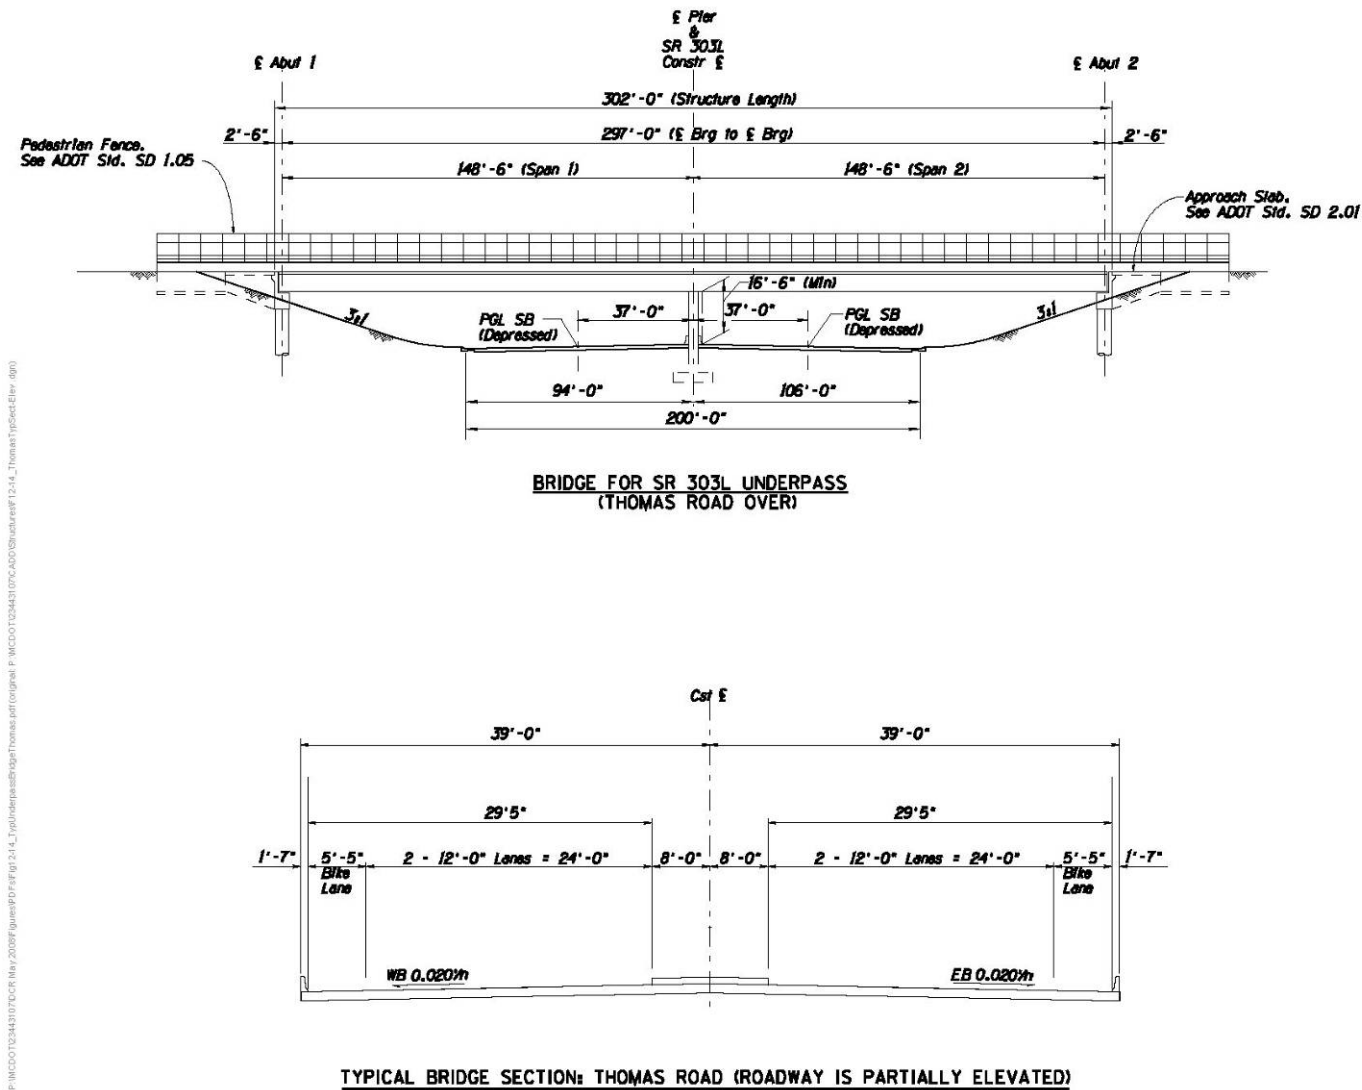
Typical Underpass Bridge for SR 303L at Thomas Road
